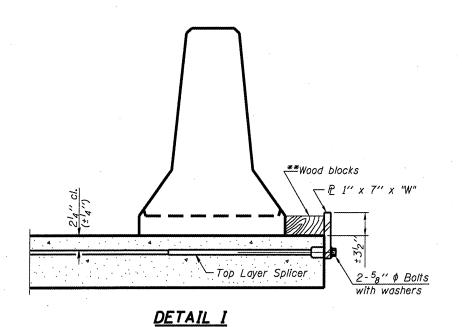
Detail I - With Bar Splicer or Couplers: Connect one (1) I" x 7' 'x "W" steel P to the top layer of couplers with 2-5g" \$\phi\$ bolts screwed to coupler at approximate & of each barrier panel.
